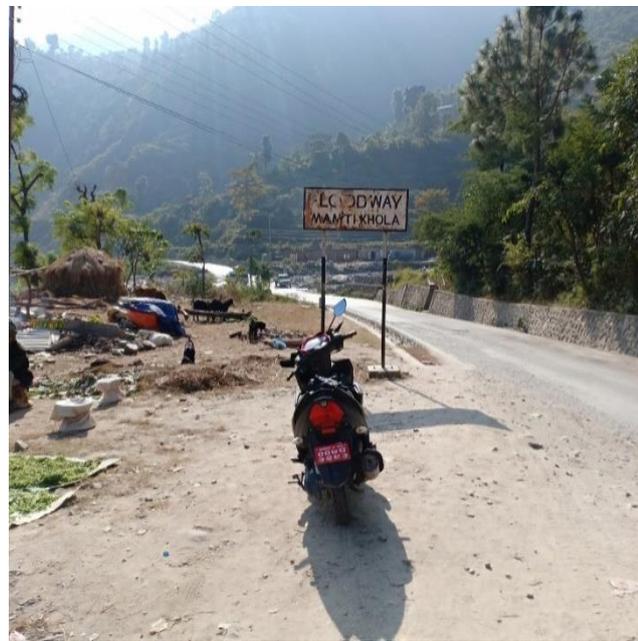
Project area Location of Mamti Khola Bridge (Ch. 113+900)
